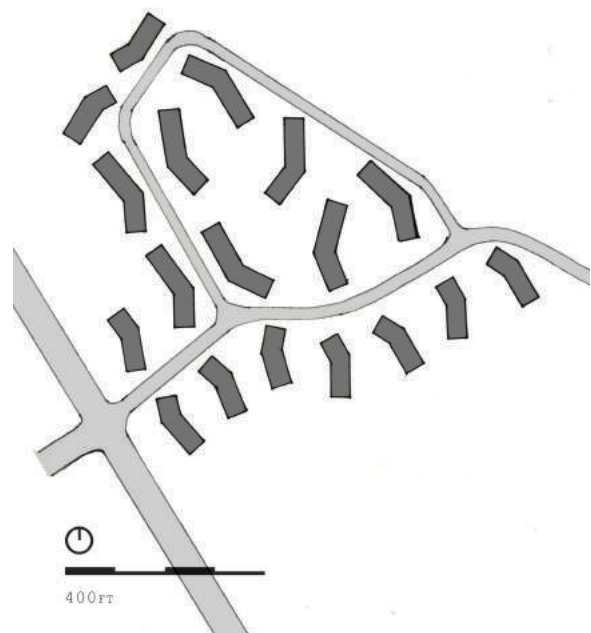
ASTOC Architects and Planners, new site plan, Buchheimer Weg, Cologne, Germany, 2012.
